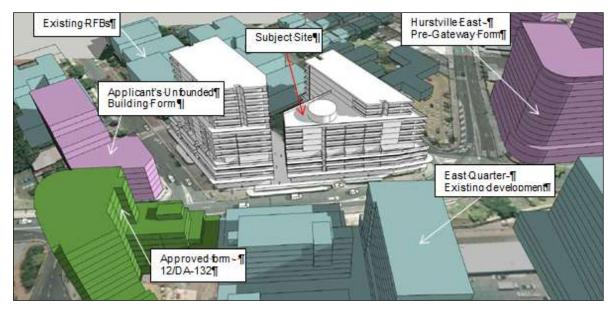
Planning Proposal Birds Eye View – Forest Road (Source: 3D Images - Planning Proposal Revision 6 – 11 March 2016)
